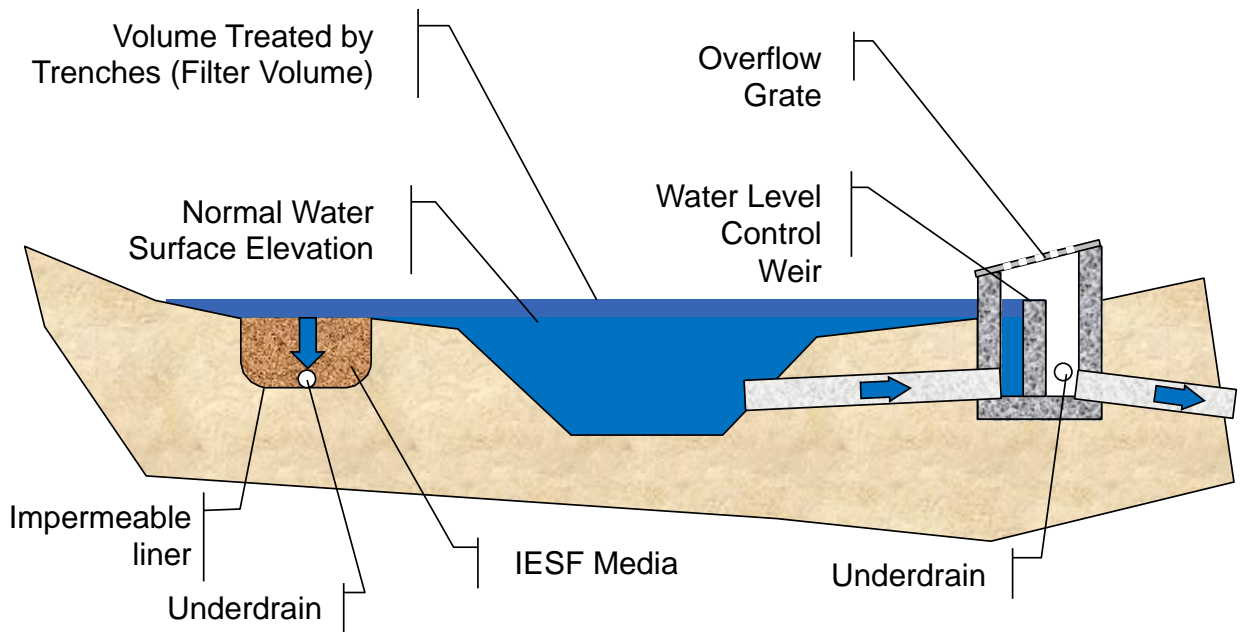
Pond-Perimeter IESF Trench Typical Schematic.
